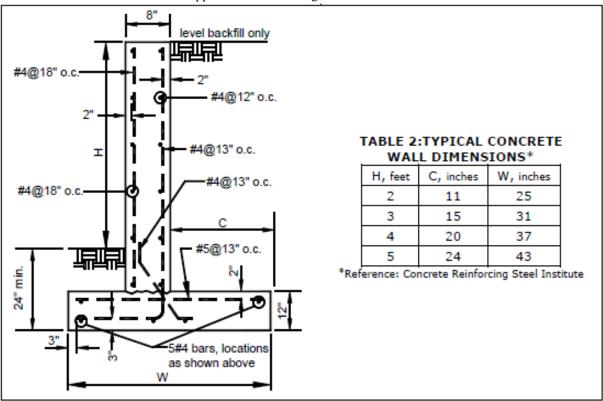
TYPICAL CONCRETE WALL SECTION
